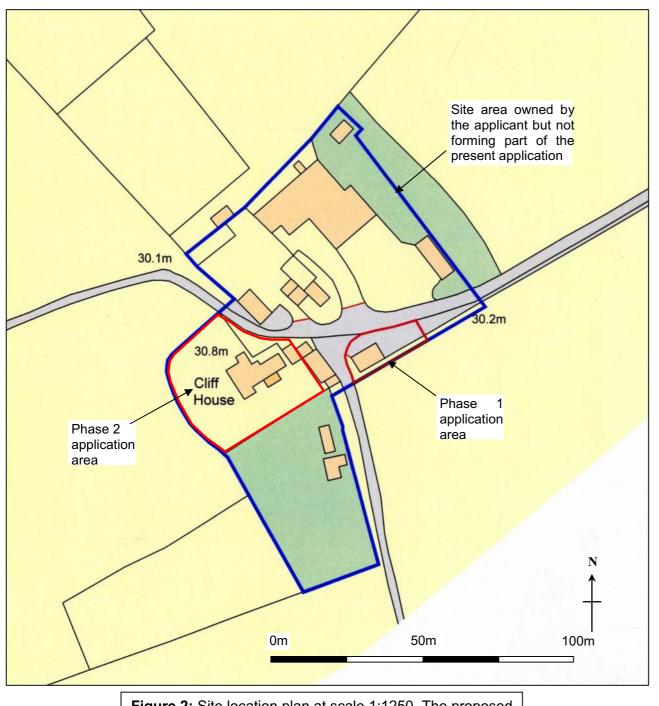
Site location plan at scale 1:1250. The proposed development site is outlined in red. Plan supplied by client.
